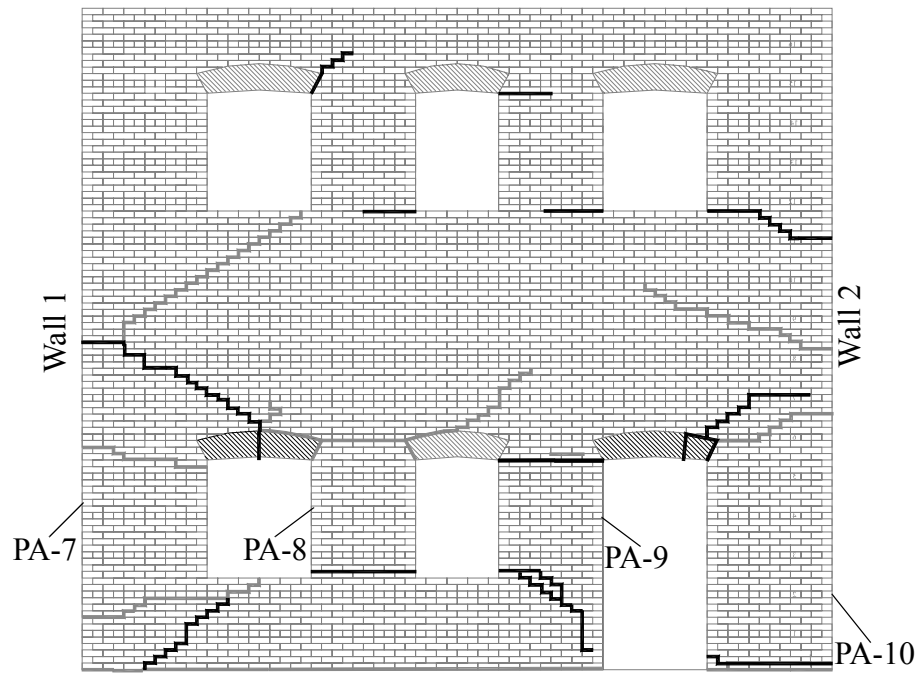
Crack pattern of Wall A following Test Run 26.
